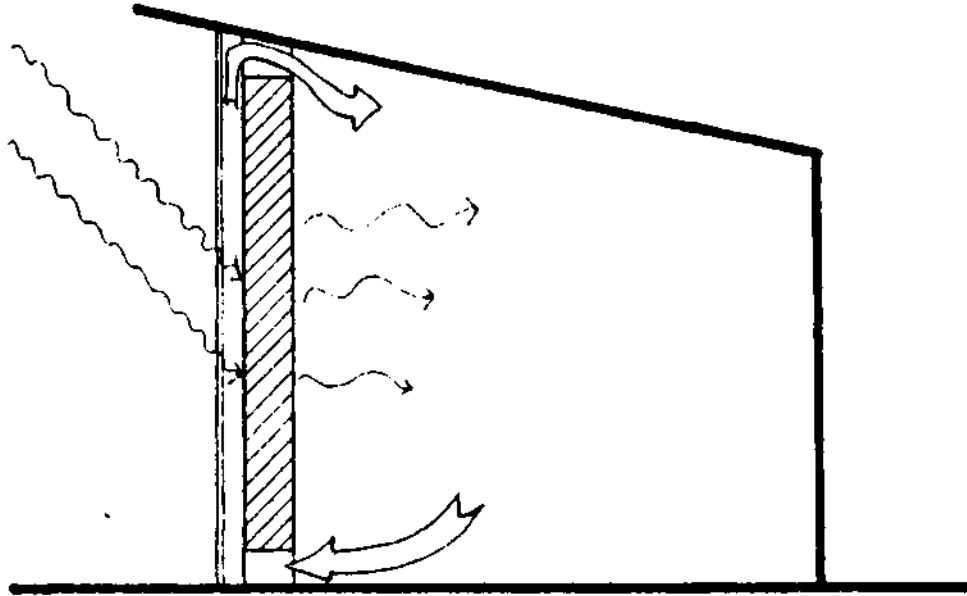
Thermal storage wall with thermocirculation vents (HON).
